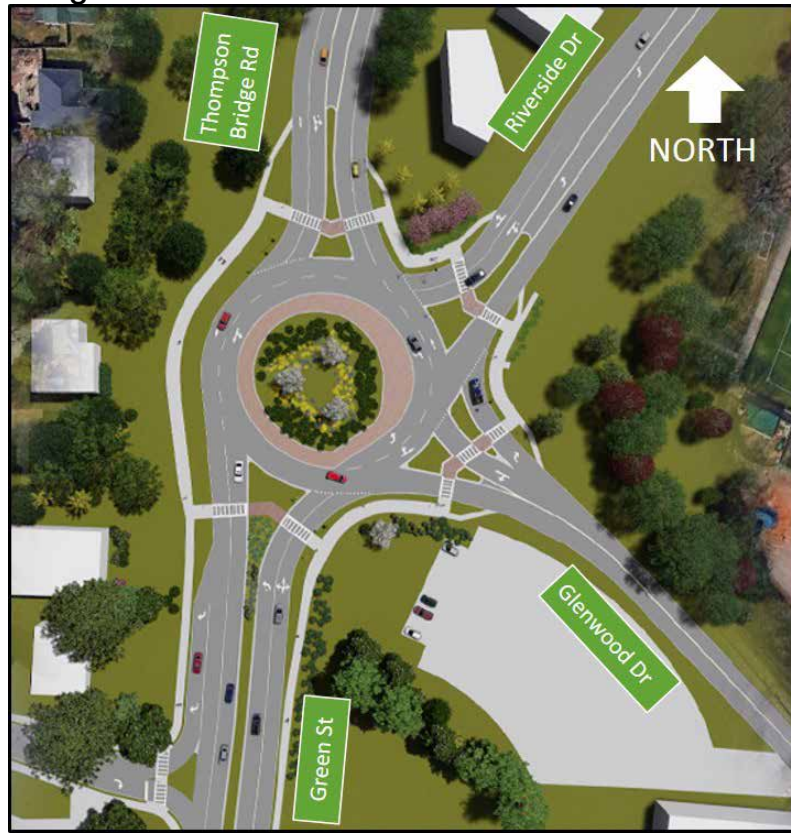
Roundabout Concept - At Thompson Bridge Road
